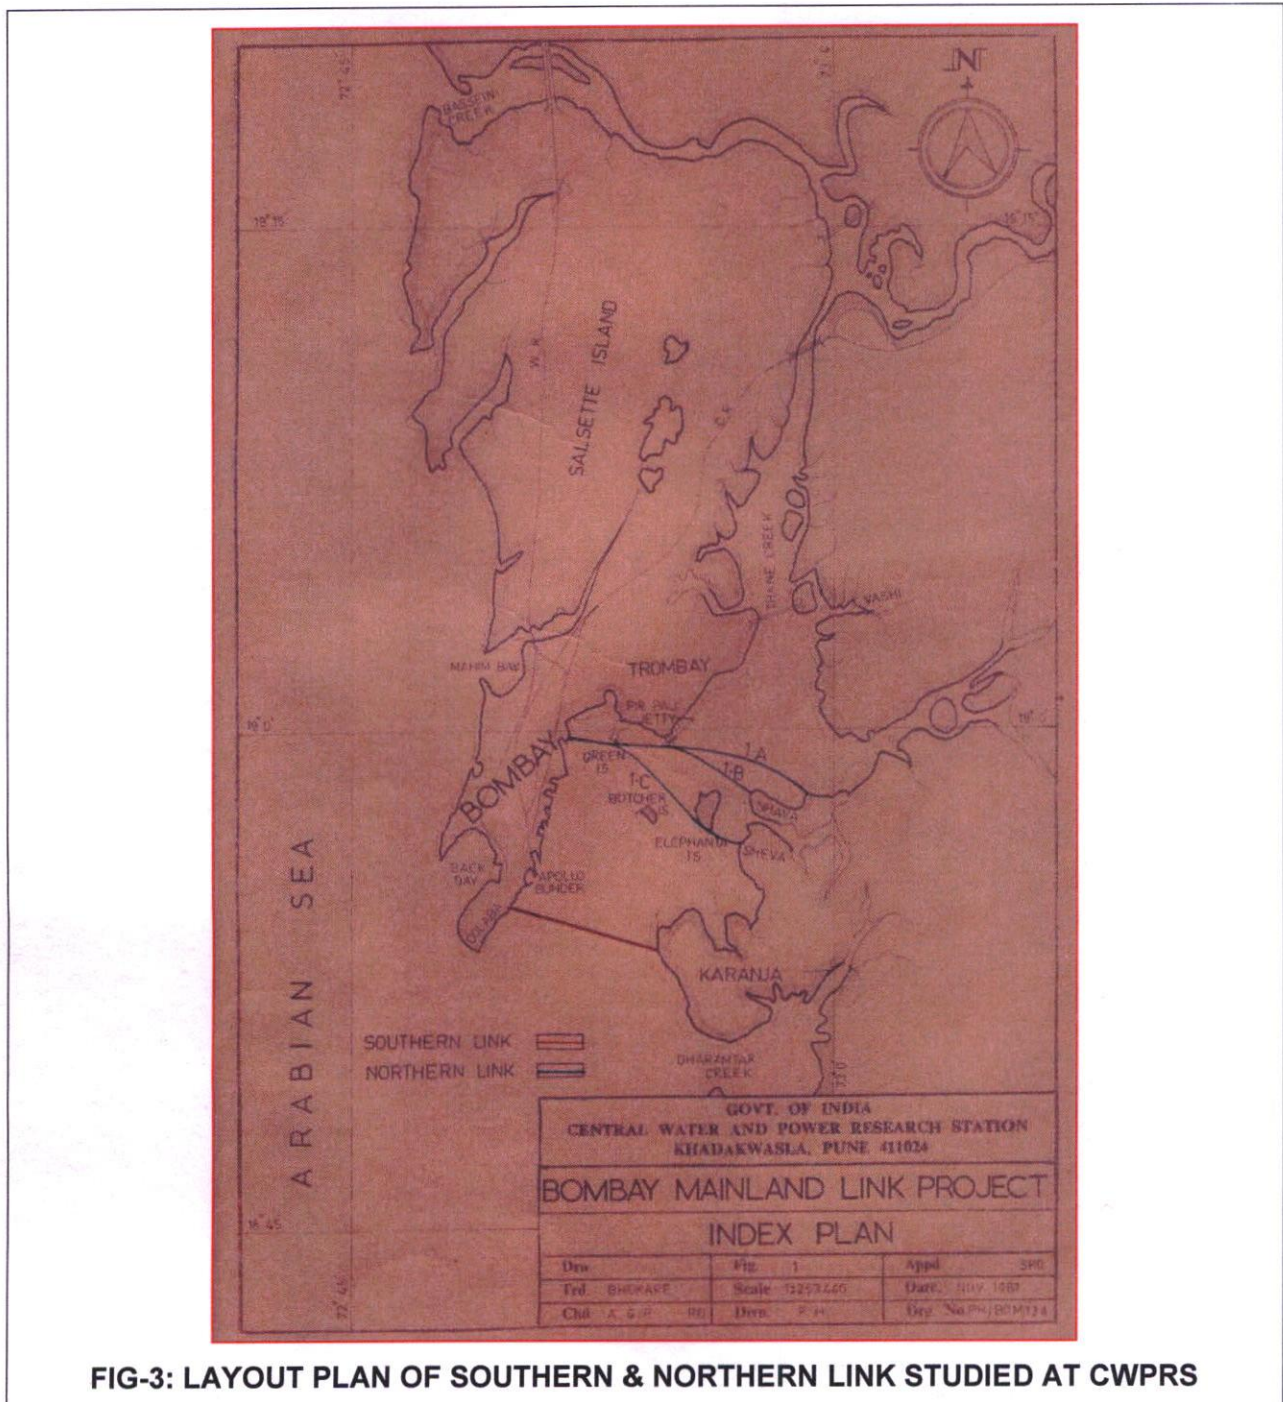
LAYOUT PLAN OF SOUTHERN & NORTHERN LINK STUDIED AT CWPRS
